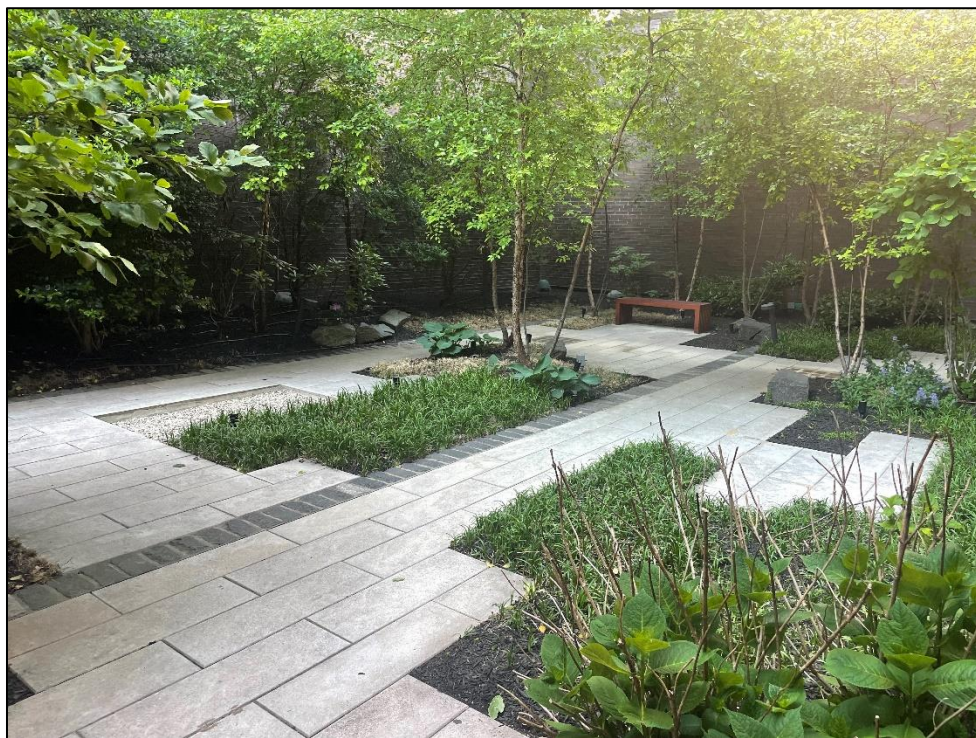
, 05/17/2023: View of landscaping and composite cover in courtyard (facing northwest).
